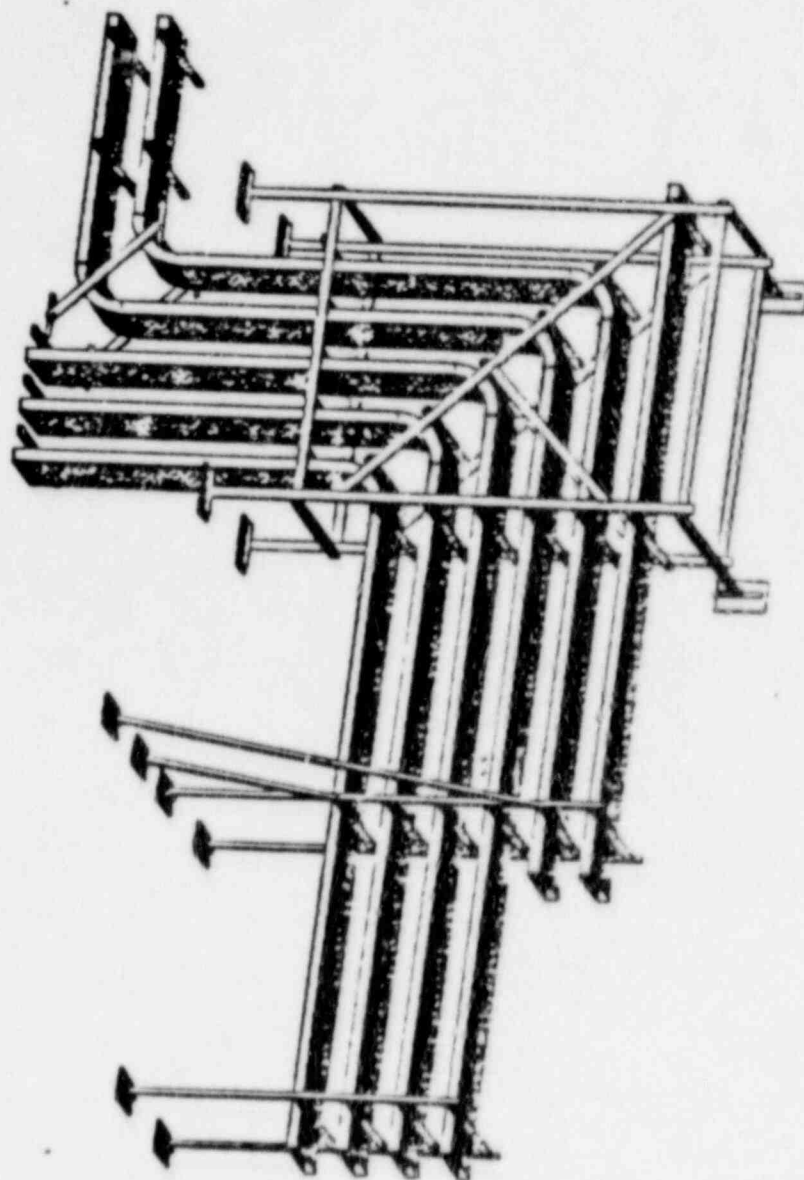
TEST CONFIGURATION (CASE C)
